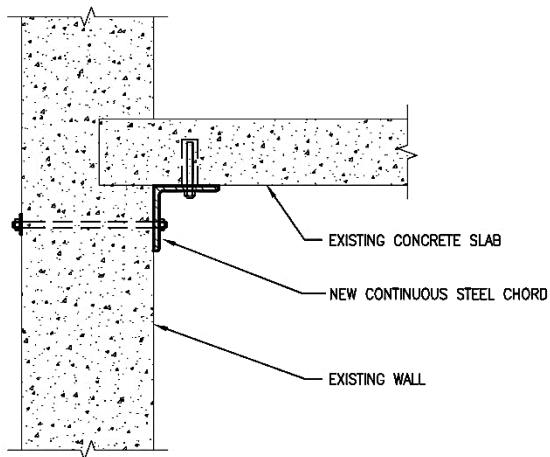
Strengthening of slab-to-wall connection (FEMA 2007)
